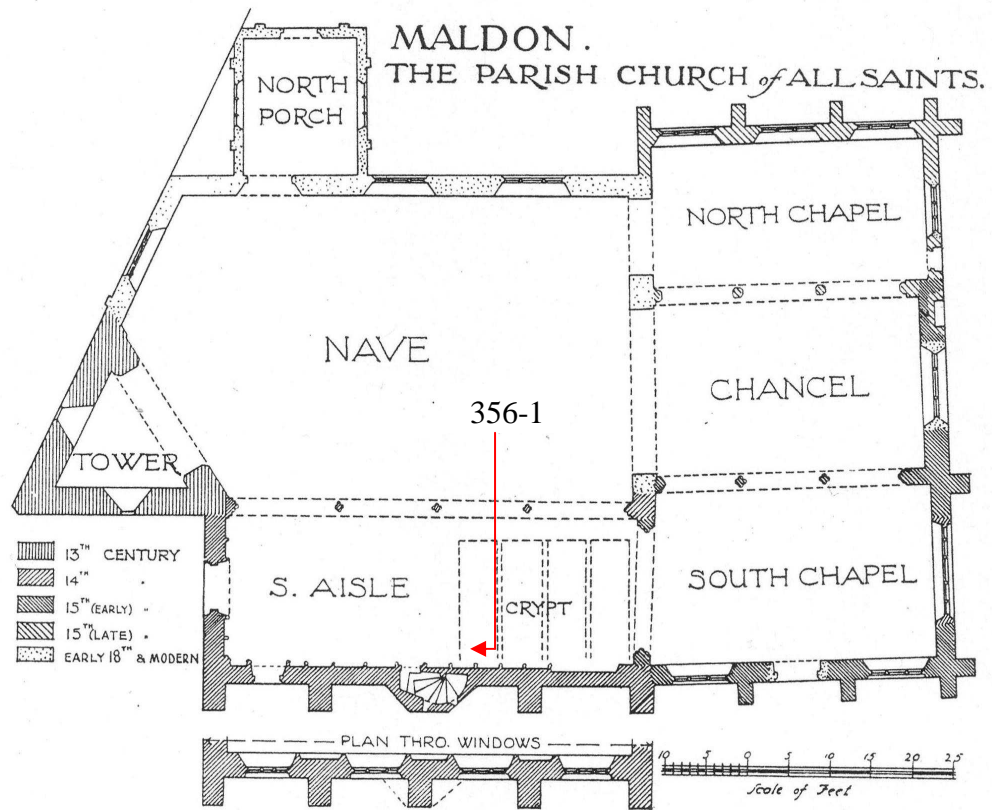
Sampling location in All Saints' church, Maldon. Note the stair in the south aisle wall leading to the sunken chamber (RCHME, 1921, 171).
